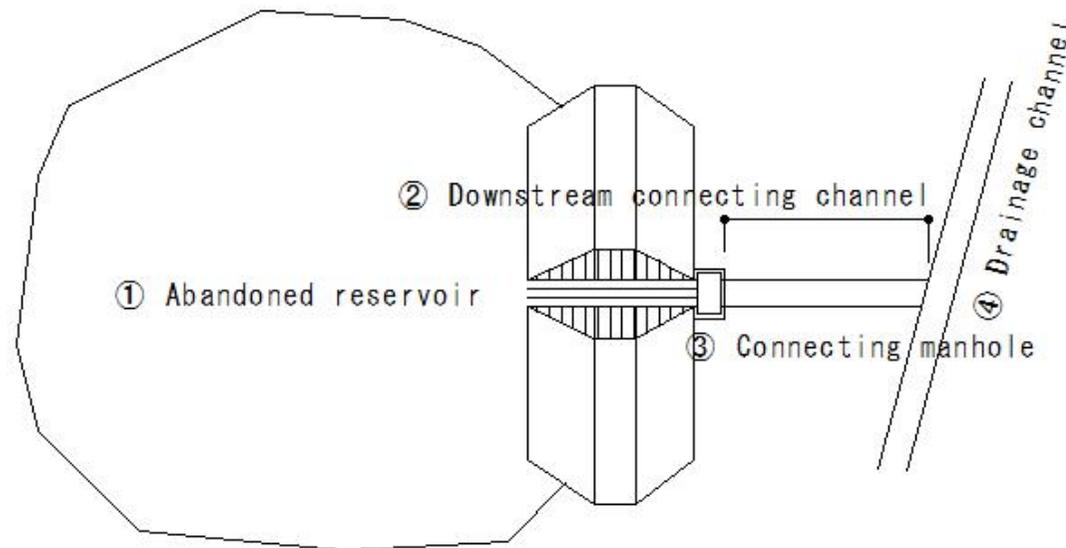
Drainage channel of abandoned reservoir and downstream connecting channel
